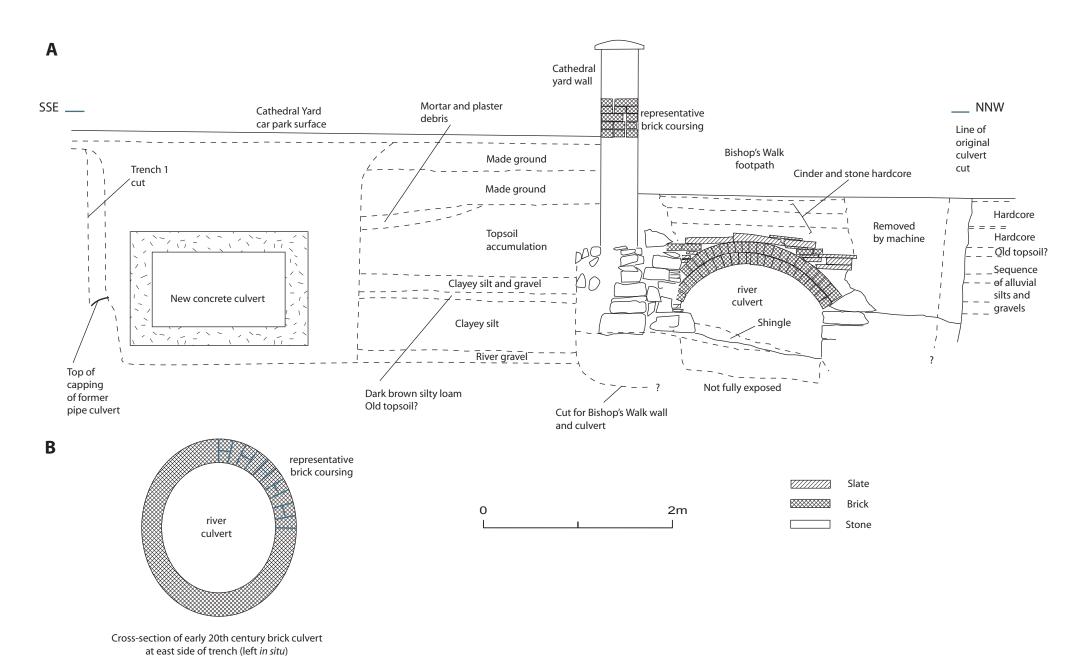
Trench 7, A Bishop's Walk, section and elevation (for location see Fig. 2). B Cross section of early 20th century culvert
